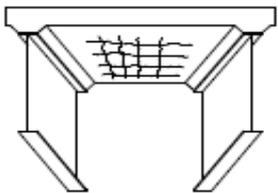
General Patterns of Crack Defects on Concrete Deck Slab
